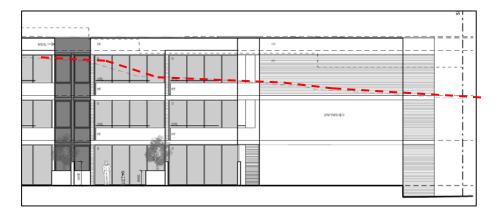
Originally proposed elevation to Maxwell Road. Red line shows the cliff line.
